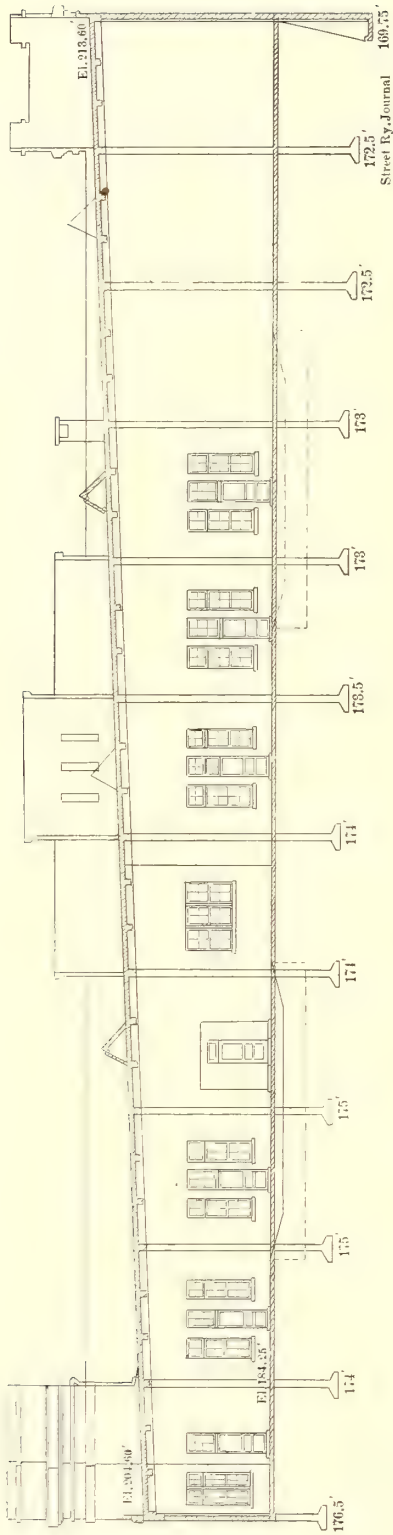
LONGITUDINAL SECTION LOOKING EAST; EDMONDSON AVENUE CAR HOUSE
